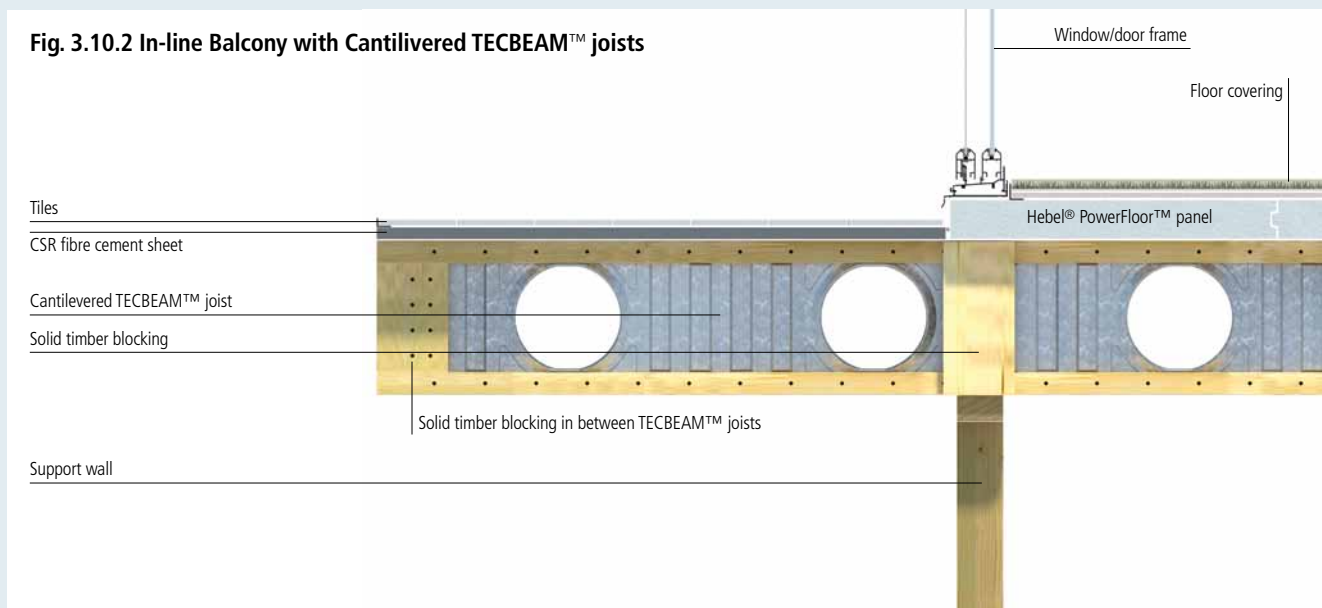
In-line Balcony with Cantilivered TECBEAM™ joists
